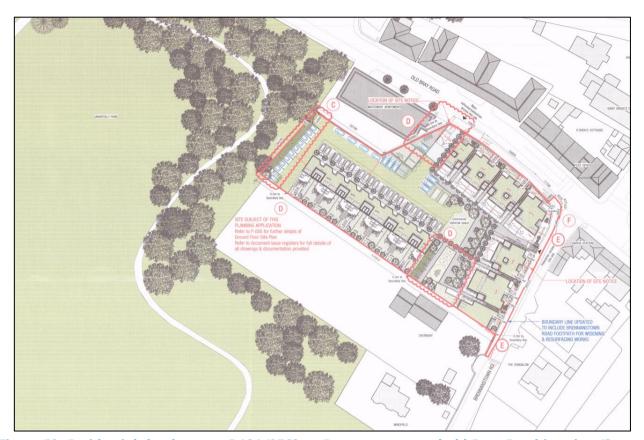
Residential development D18A/0763 at Brennanstown and old Bray Road junction (Source: McCullough Mulvin Architects)
